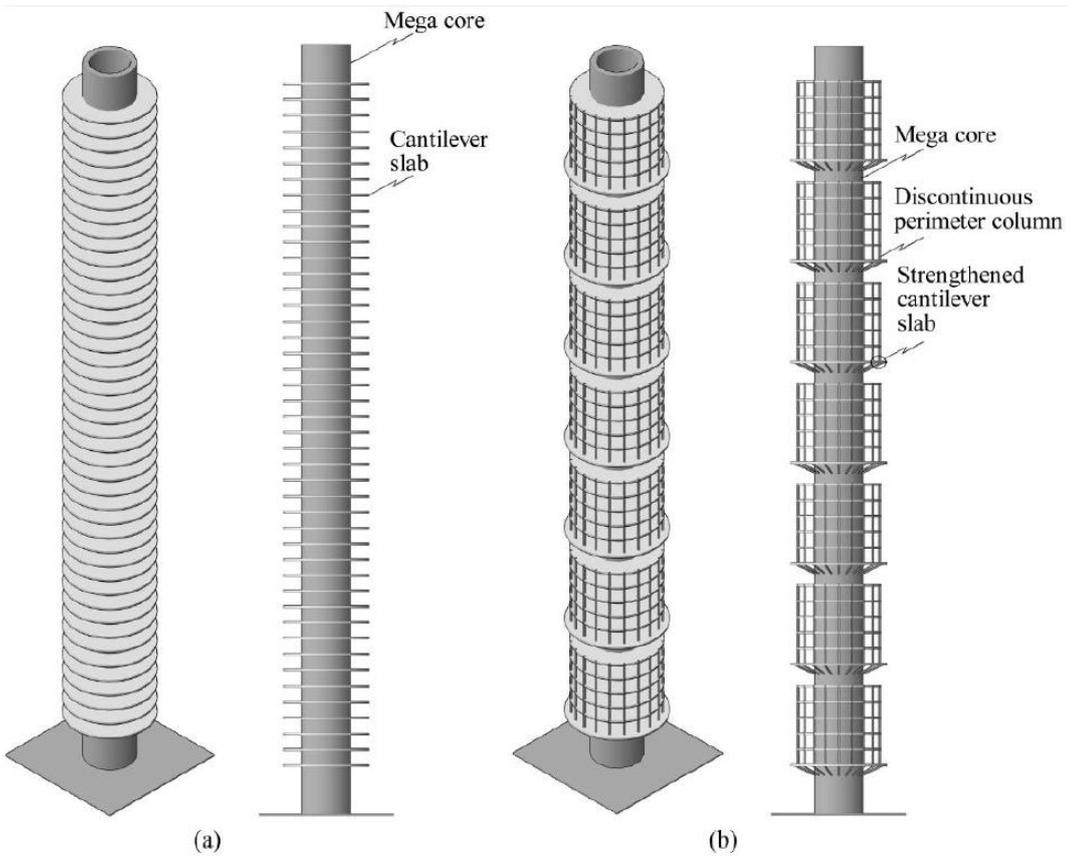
Mega core system: (a) cantilever slab, (b) supported cantilever slab
